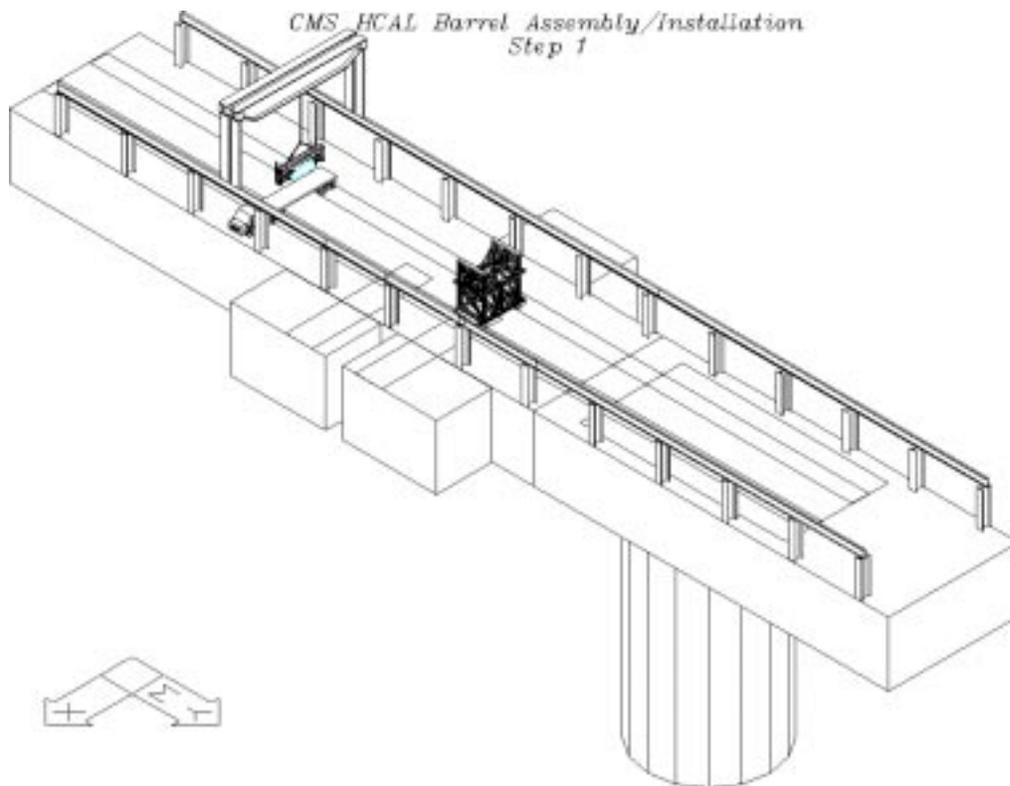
CMS HCAL barrel assembly/ installation step 1.
